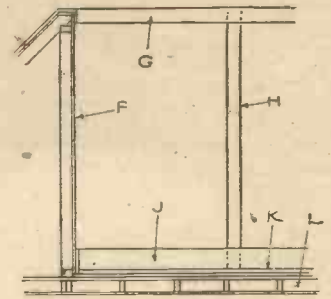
SECTION SHEAVING SKIRTING AT JUNCTION BETWEEN FLAT AND PITCHED ROOF; AND COVER STRIPS OVER JOINTS IN VERTICAL CHEEKS OF PITCHED ROOF.
